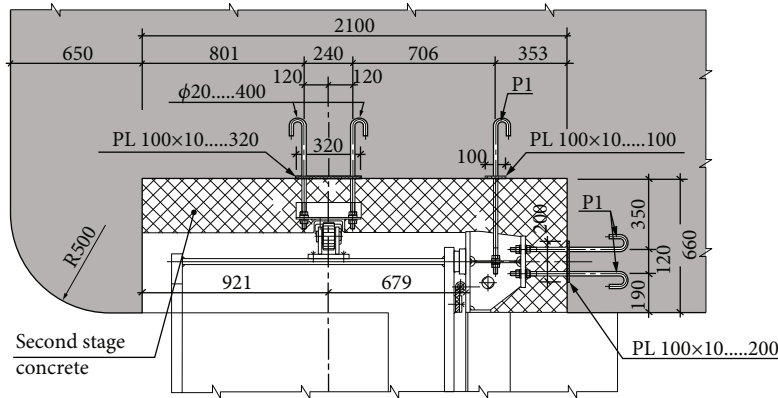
Detail 2: steel plate and anchor connection in the first and second phases of the concrete.
